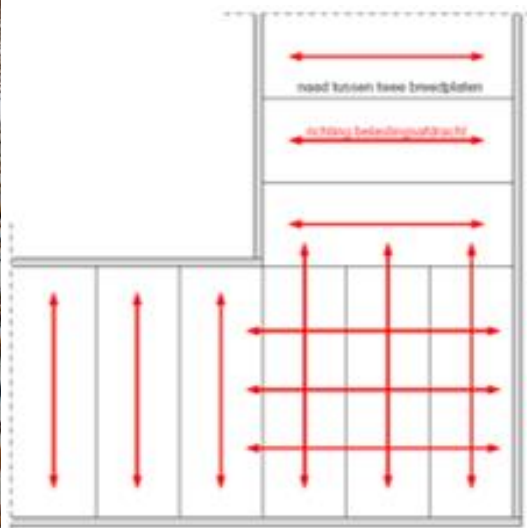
Bubble deck elements spanning in one or two directions (corner area).
